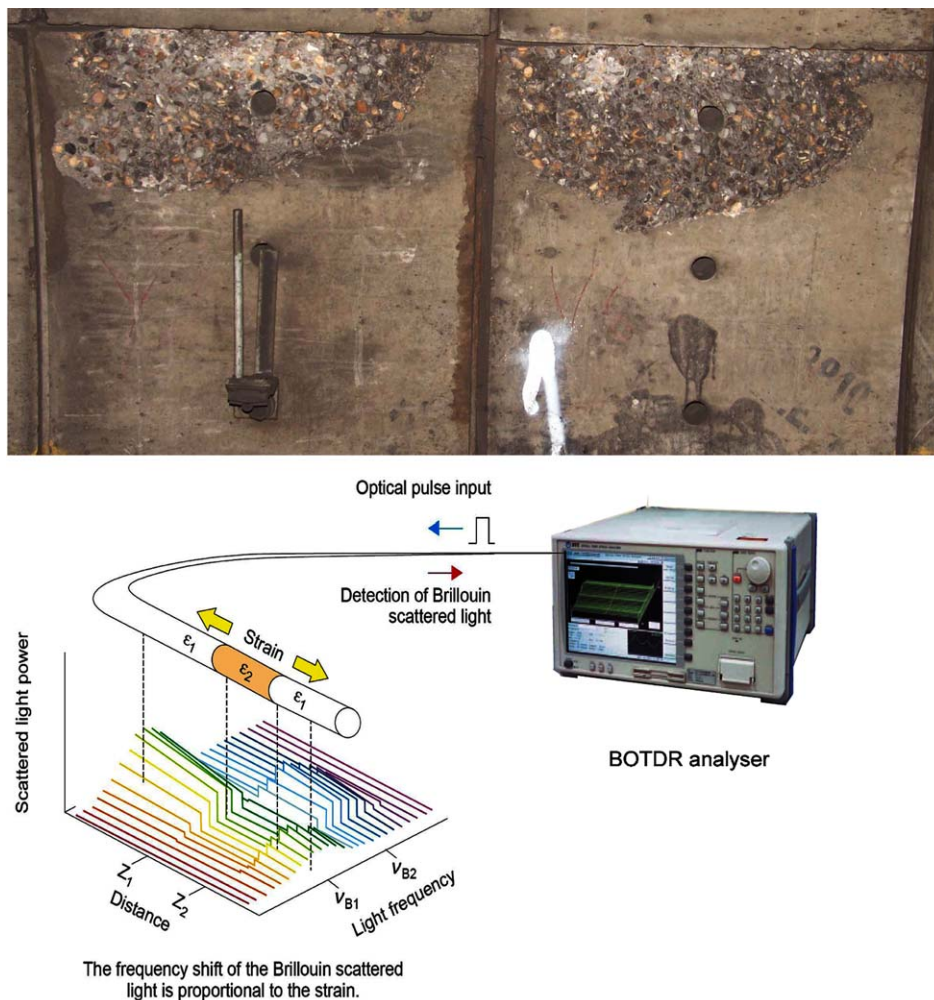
Concrete lining spalling and BOTDR fibre optic monitoring
